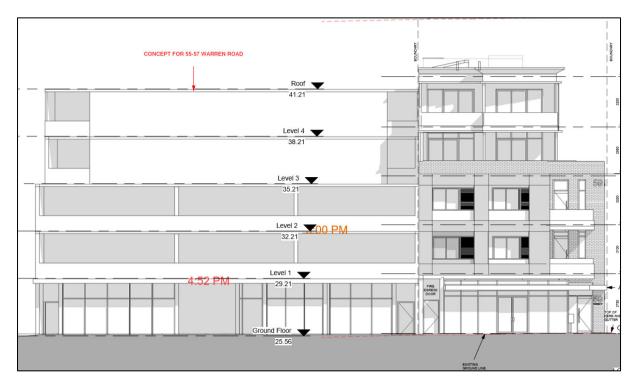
Extract of concept front elevation of No.55&57 Warren Road
